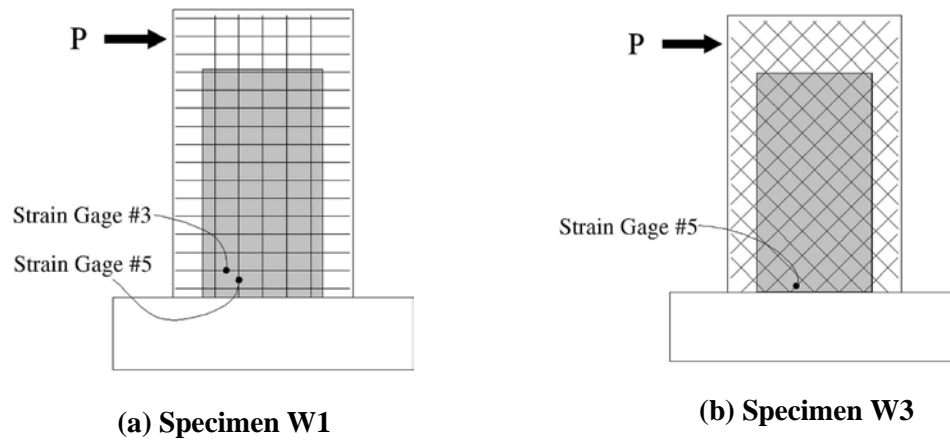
Reinforcement Layout in the Wall Specimens Tested by Sittupunt et al. (2001)
